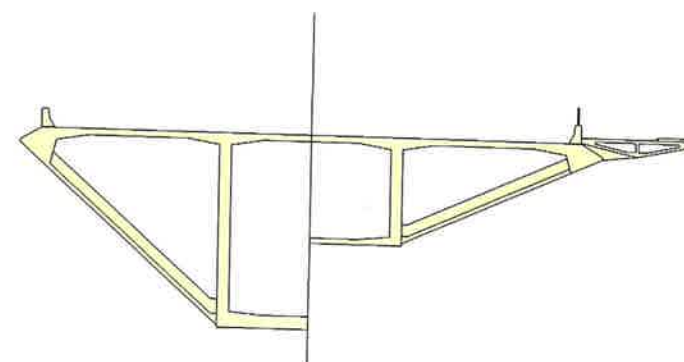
Skyway, Haunched Concrete Girder (Section Elevation)
